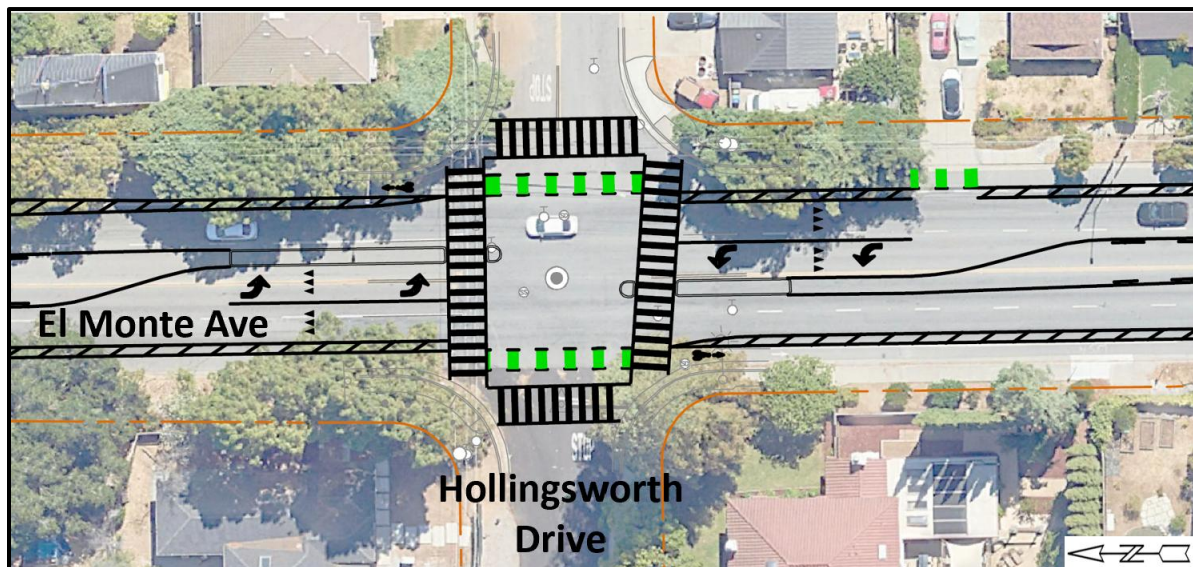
El Monte Avenue Intersection with Hollingsworth Drive
